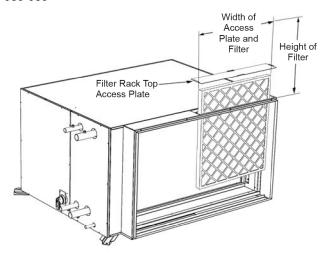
Clearance and Access Requirements for Horizontal Units (Sizes 006-050)
